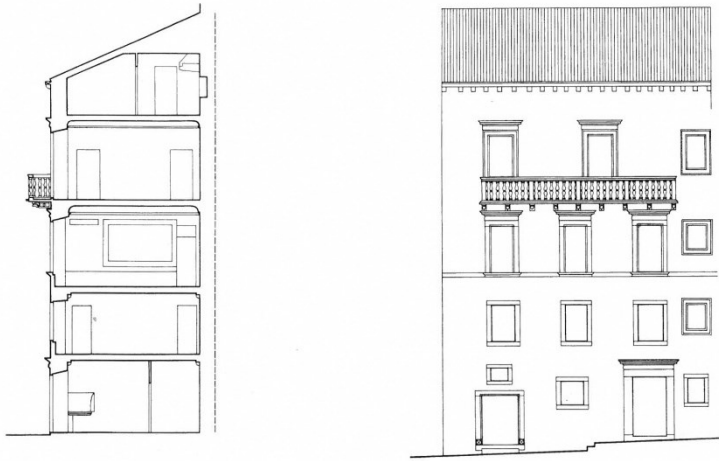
Section and elevation of Baroque renovation of Renaissance *Palača Bošković*.
